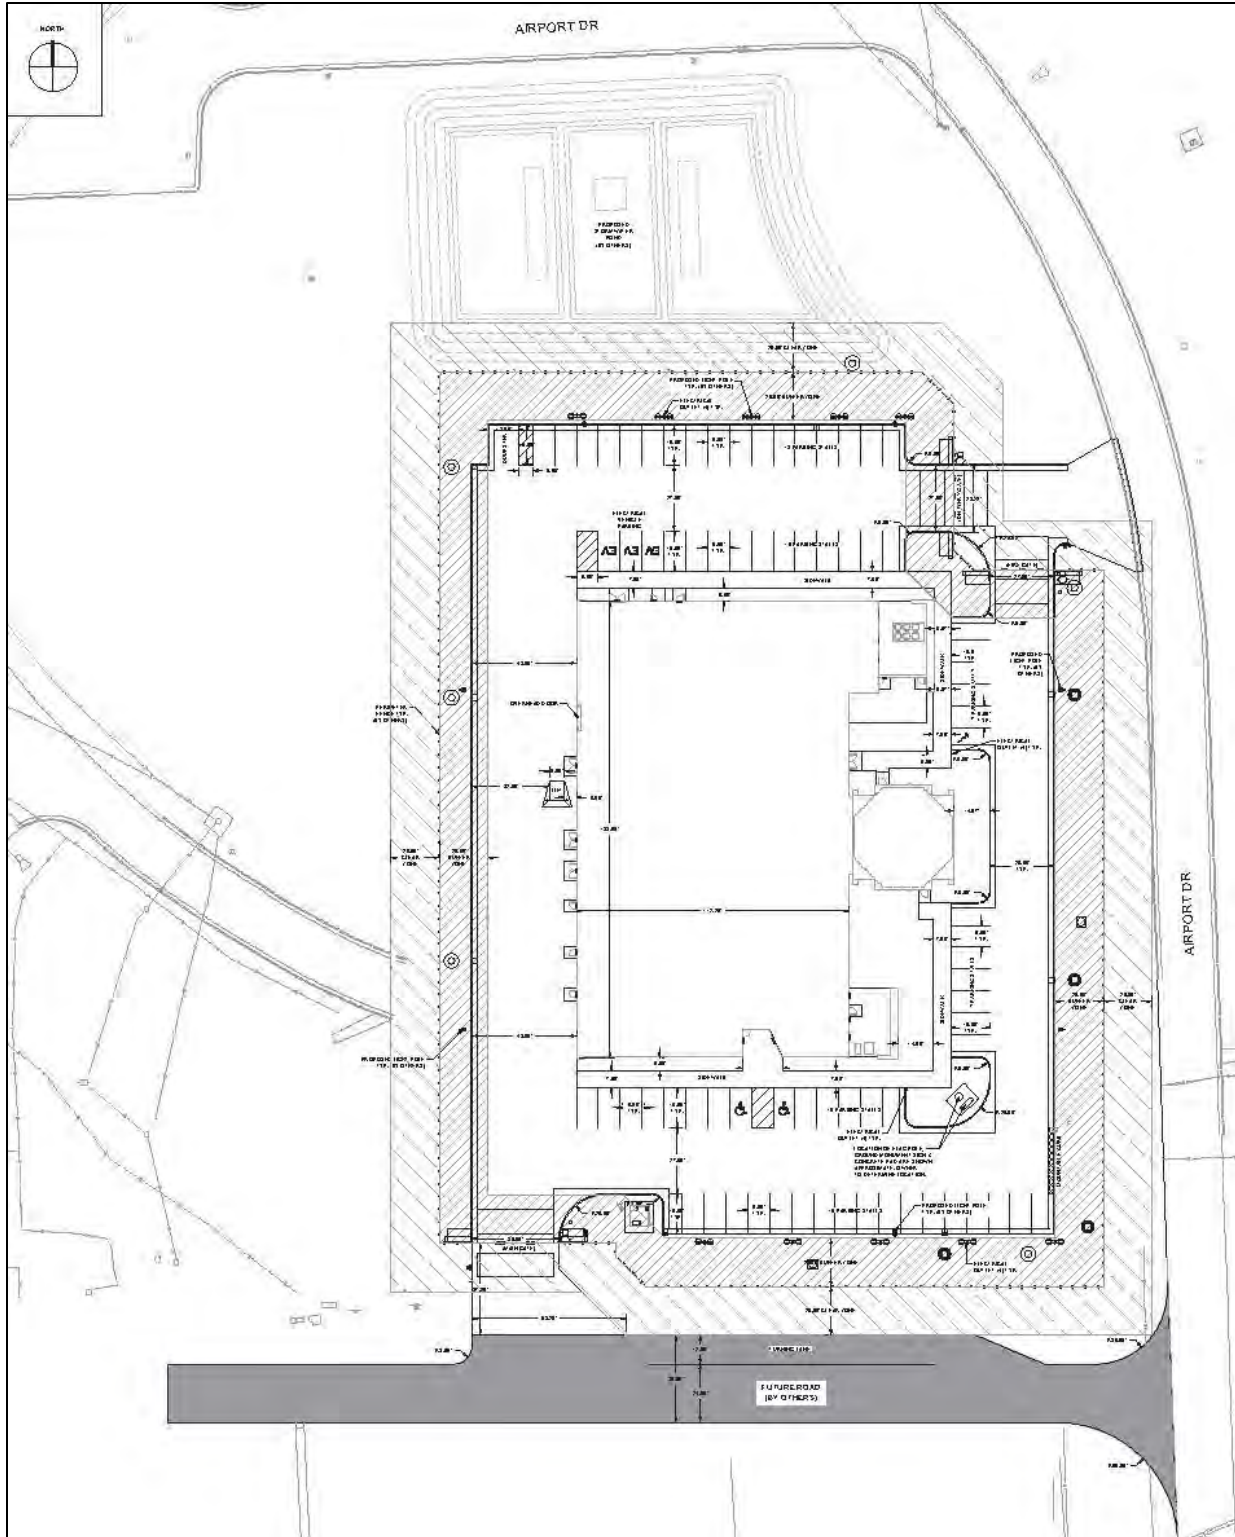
Preliminary Schematic of Proposed ATCT Site
